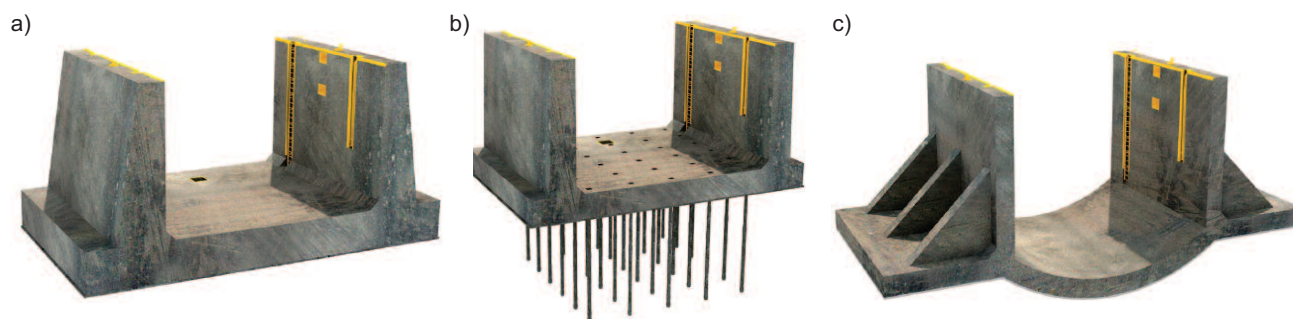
Chamber section: a) massive; b) anchored; c) with arched bottom slab
